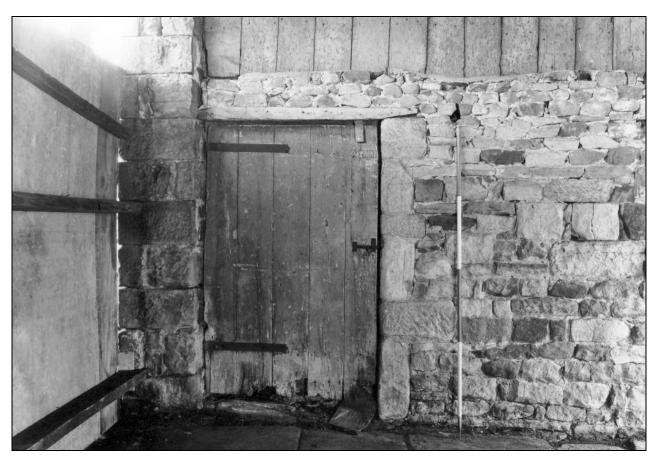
Historic door within cross wall of barn, from the south (film 2, frame 7)
